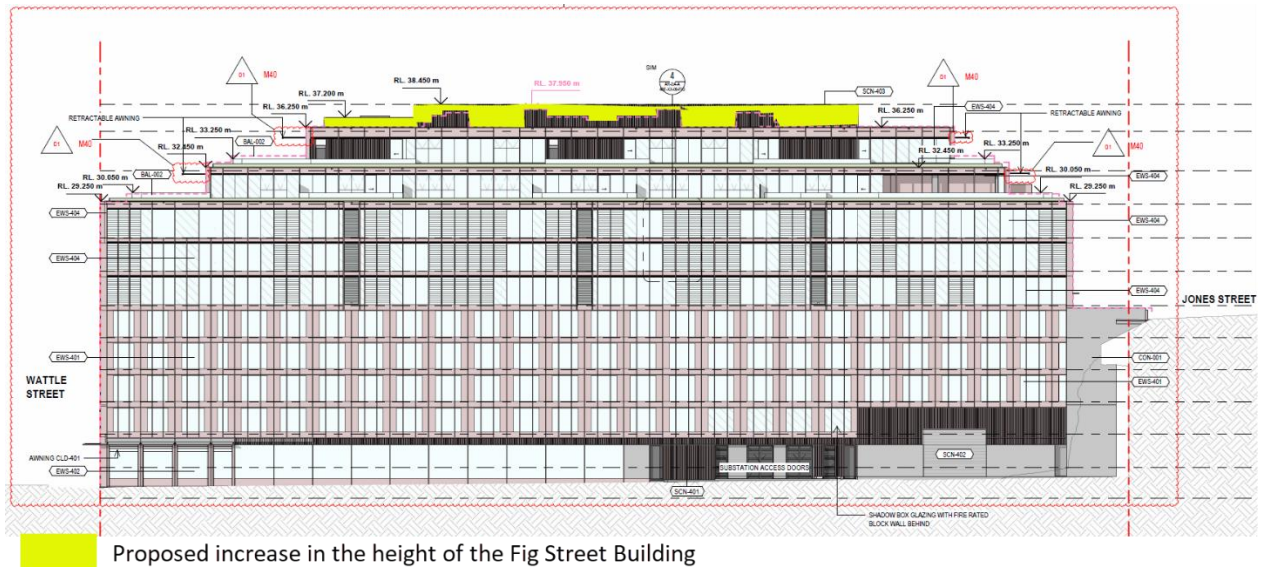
Fig Street Building: Fig Street elevation showing proposed increase in building height
